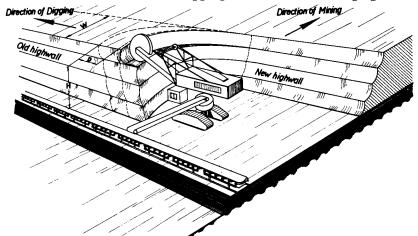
Block-digging operation with wheel excavator feeding onto a movable conveyor belt.
